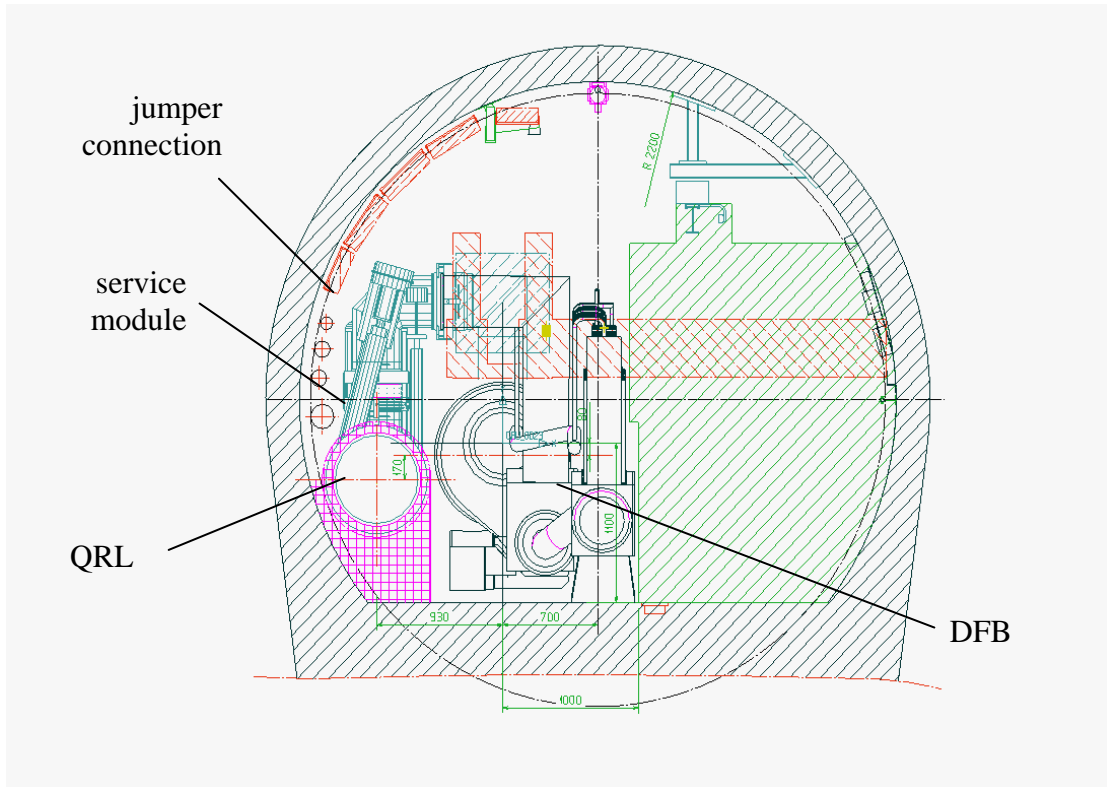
Enlarged tunnel cross section (RA) with DFBA
